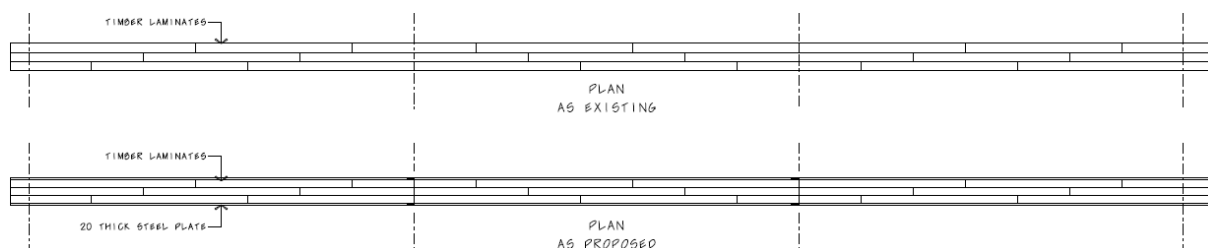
Strengthening of Bottom Chord while Retaining Original Laminate Layout
